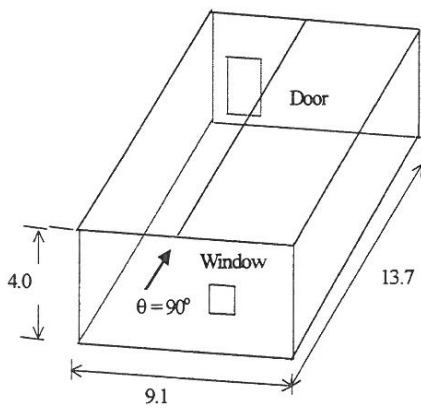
13.7 x 9.1 x 4.0 m Texas Tech full-scale building showing 0.8 m<sup>2</sup> (2% wall) window and 2.0 m<sup>2</sup> (5% wall) door.
